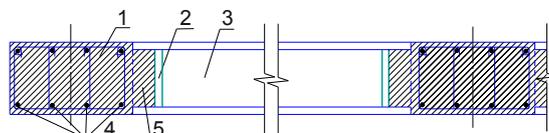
The joint of the slabs with bearing girders building floor of the ARKOS structural system:
